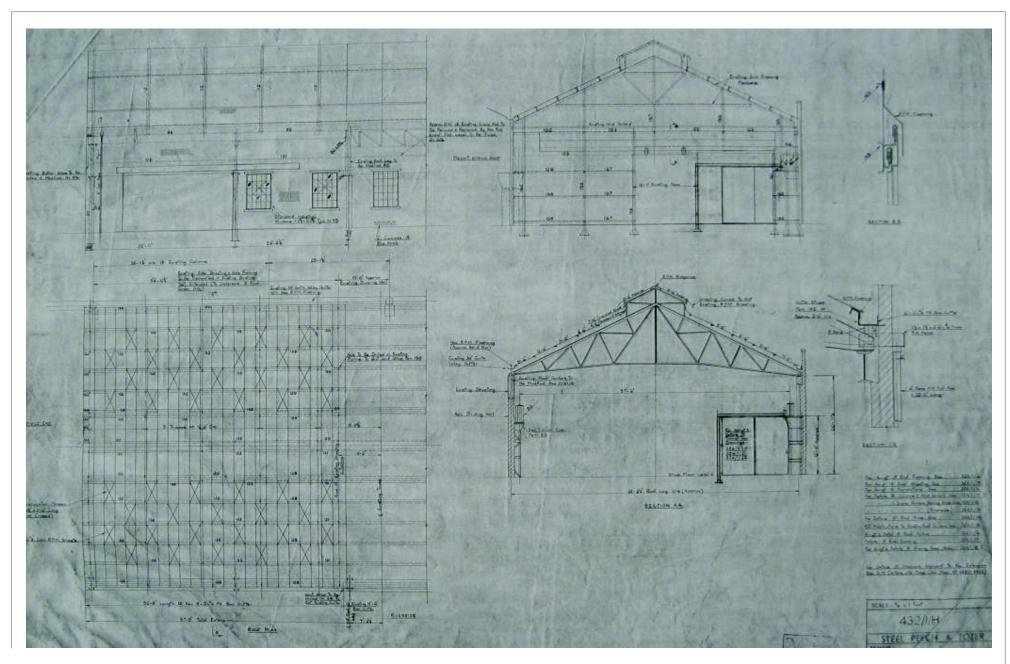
Plan, sections and elevation of extension to Building C, 1955
